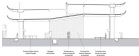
Cross-section of a traditional Chinese building, showing the structure of the roof, wall, and foundation.
